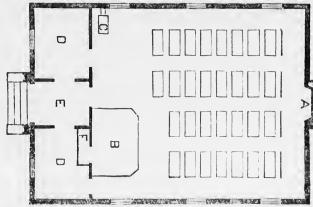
Ground Plan adapted to Figs. 58, 60, 71 and 77.
